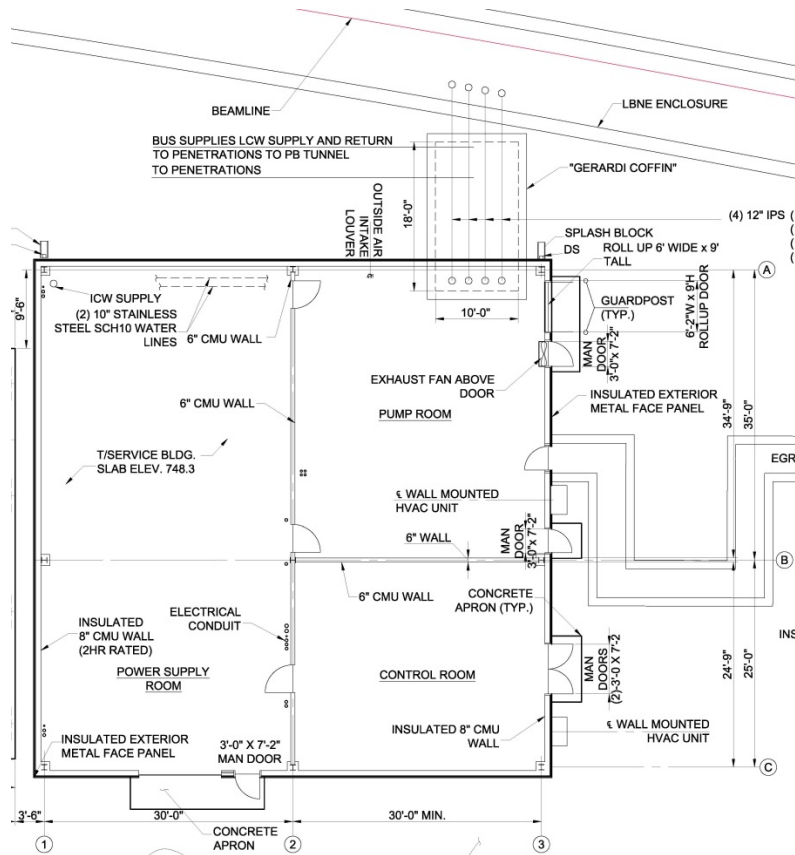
Primary Beam Service Building (LBNE 5) Floor Plan.
